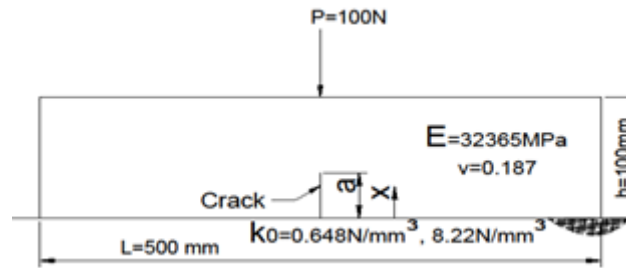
Unreinforced beam on RF or CF subjected to central pointed load
